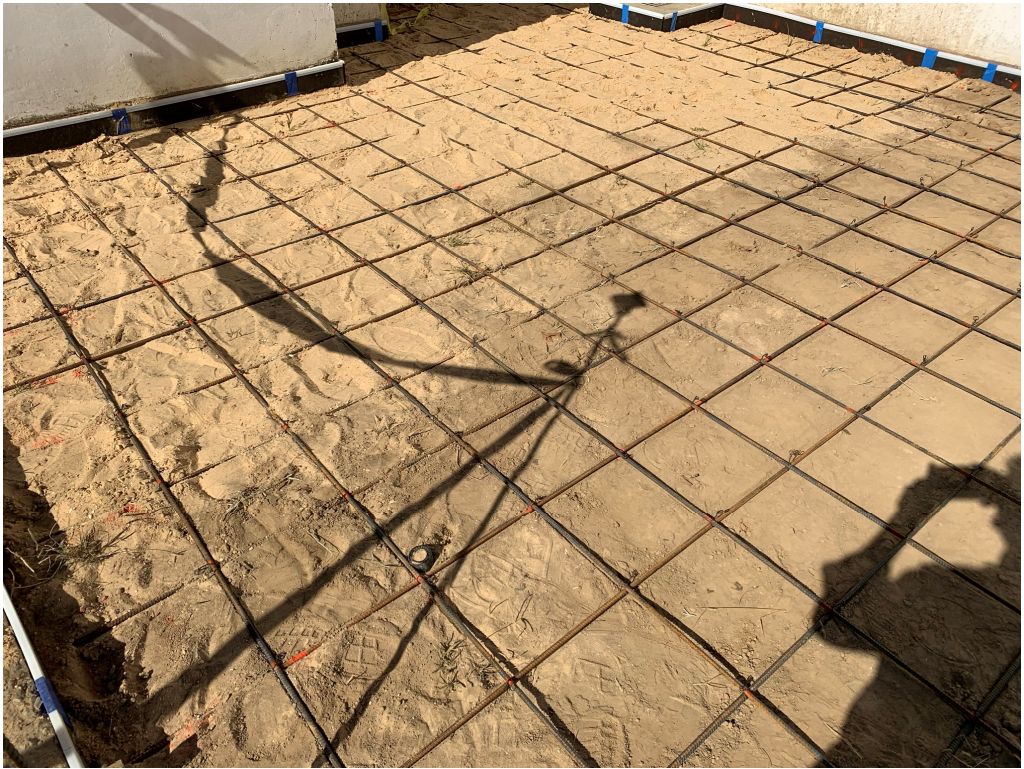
Rebar Made up (lift rebar on chairs before pour)
